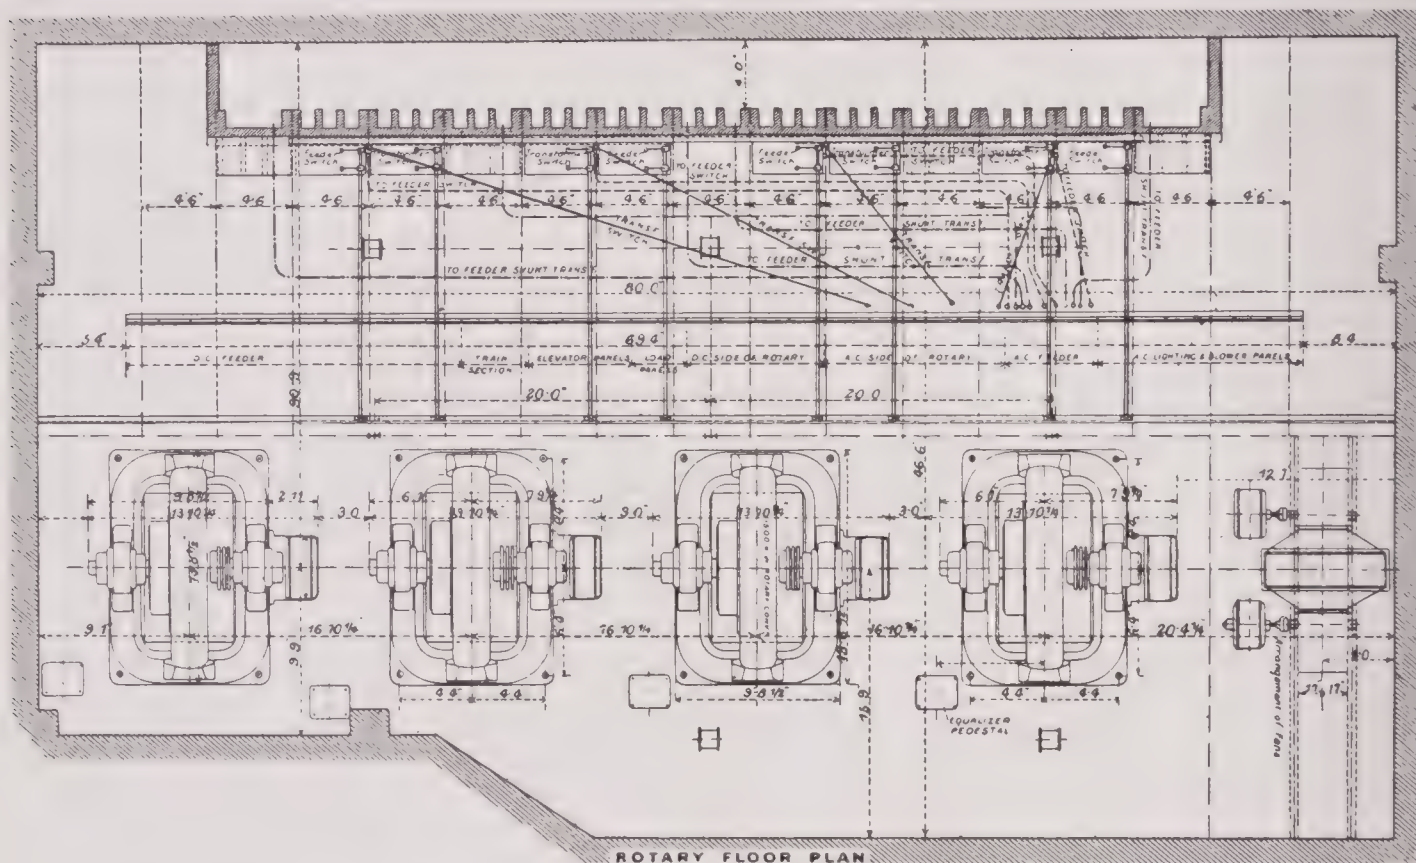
DISTRICT RAILWAY: PLAN OF CHARING CROSS SUB-STATION.
